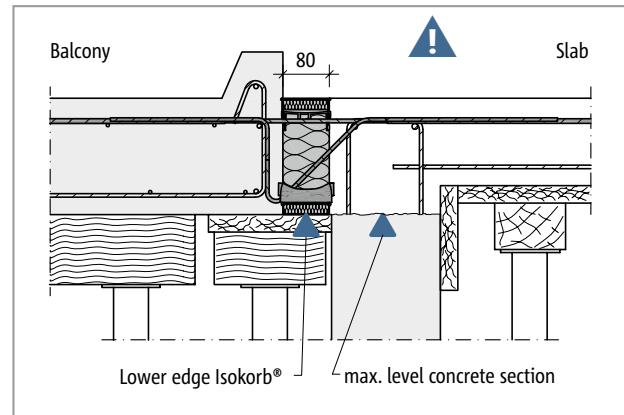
Schöck Isokorb® T type K: Fully-finished balcony with height offset floor on fully-finished reinforced concrete wall
